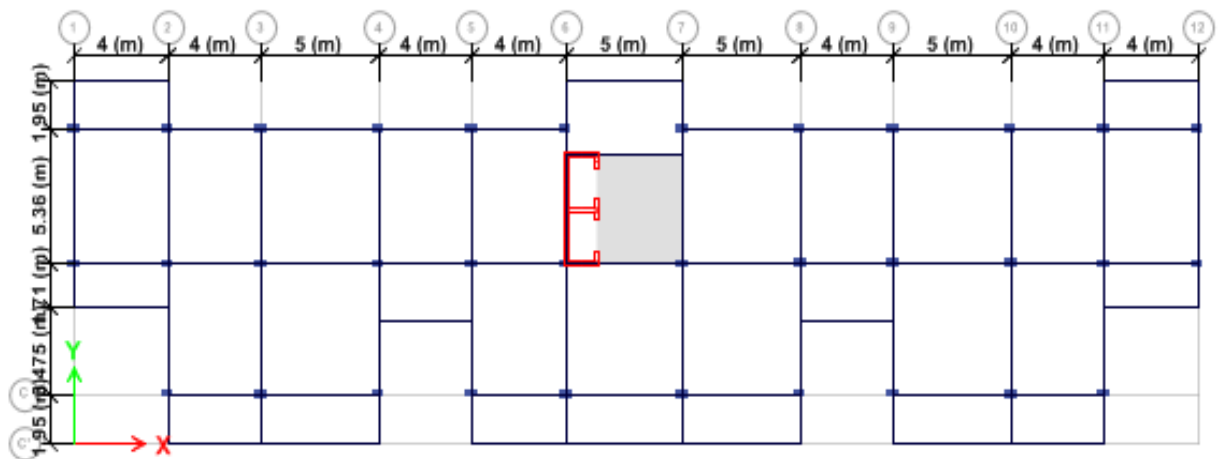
Typical Plan View of Eight Storey RC building with Shear Wall
